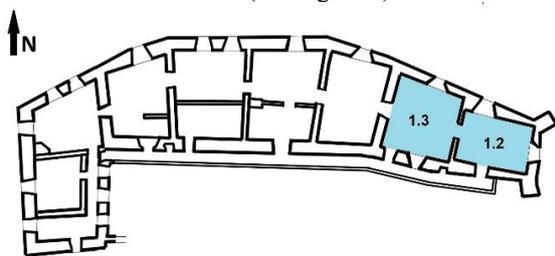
Floor plan of the Northern Castle of Wieliczka Saltworks Castle.
